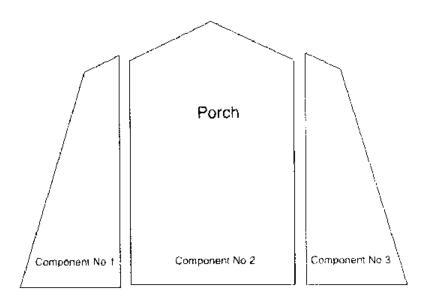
The Mk 3 end panel (Typical arrangement viewed from inside)
